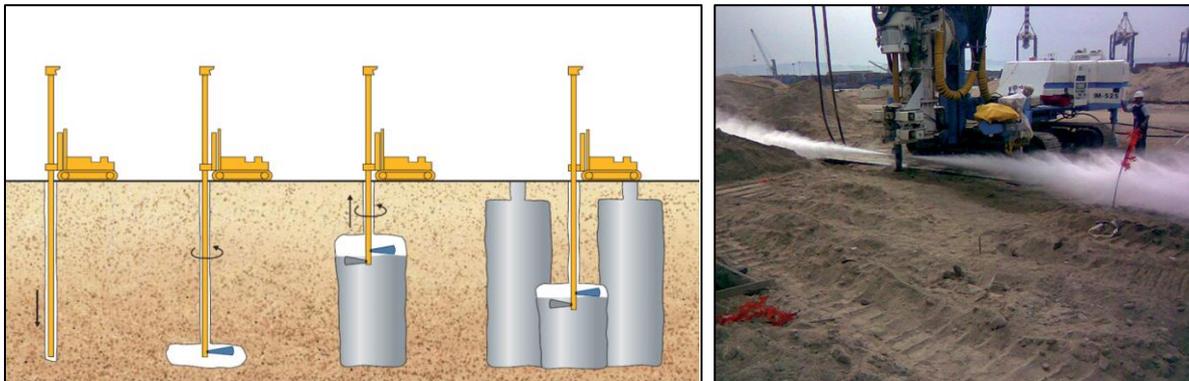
SCHEME OF JET GROUTING INSTALLATION (LEFT). MACHINERY USED FOR CONSTRUCTION (RIGHT) (TRB, 2012)
